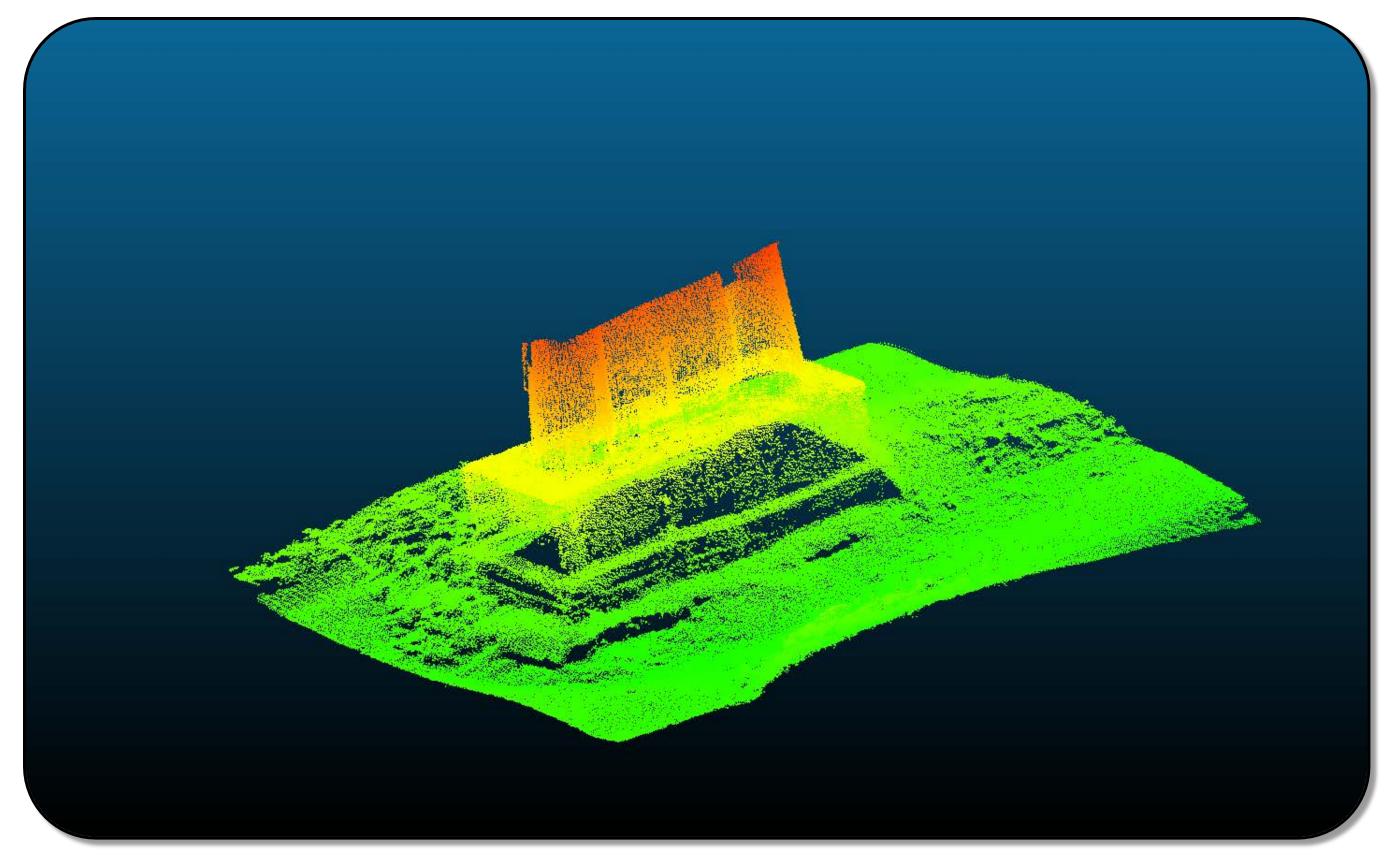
Perspective view of Pier 14 point cloud (looking from the northeast direction).
